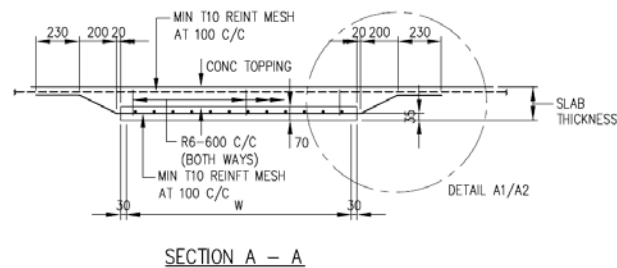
CONNECTION DETAILS BETWEEN LOWER AND UPPER PRECAST HS
